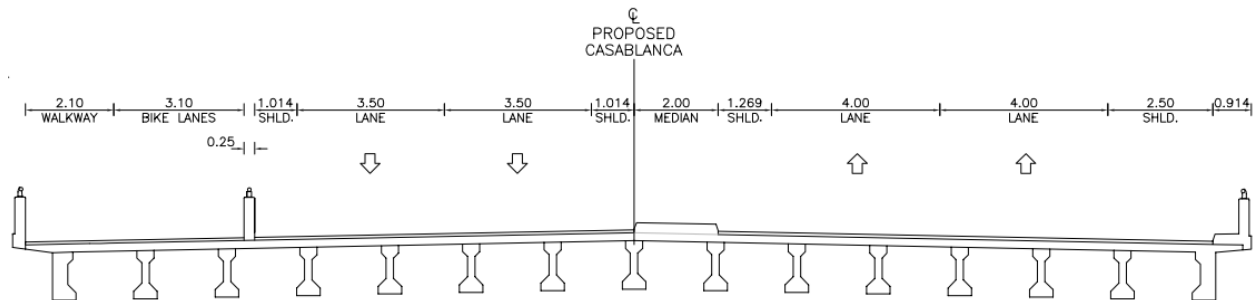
Cross Section of Proposed-Casablanca Boulevard Across QEW Structure (Looking North)
